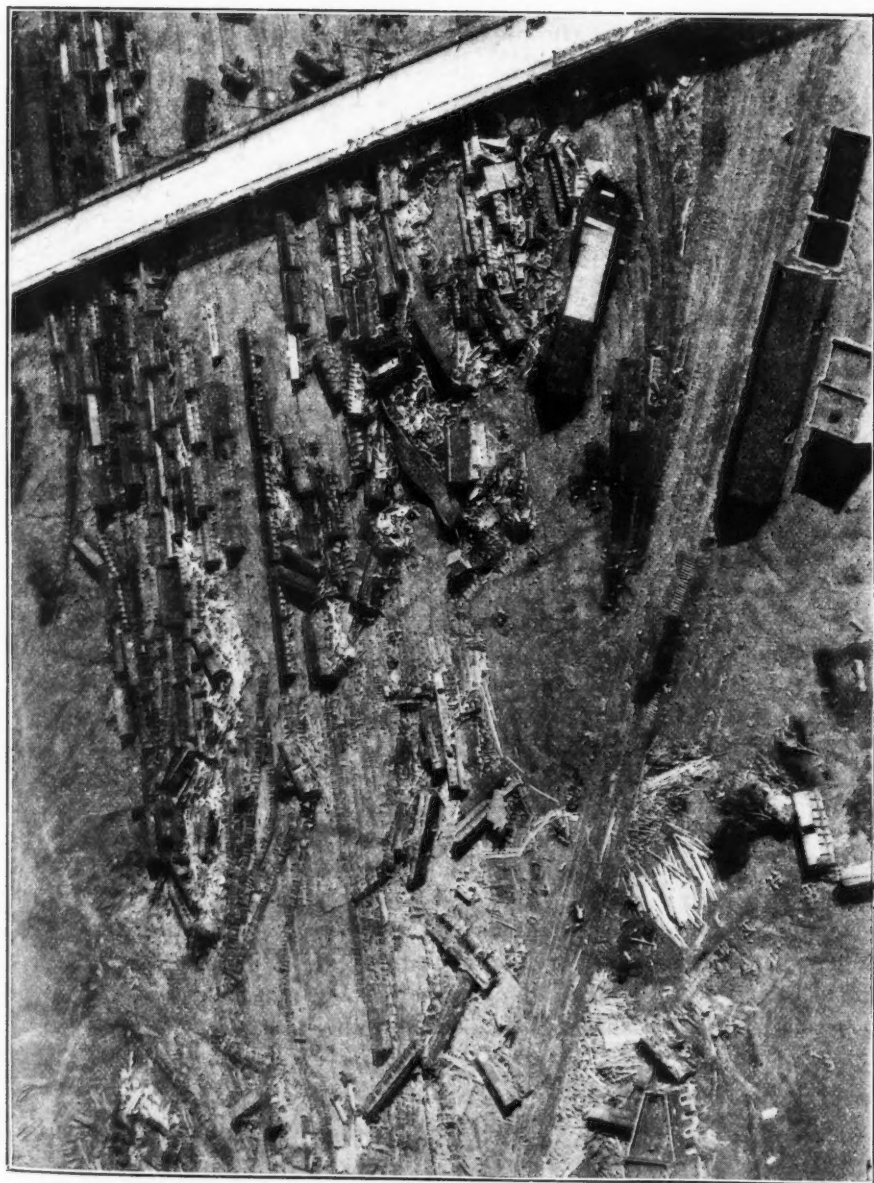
AEROPLANE VIEW OF FLOOD DAMAGE IN RAILROAD YARDS, PUEBLO, COLO.
